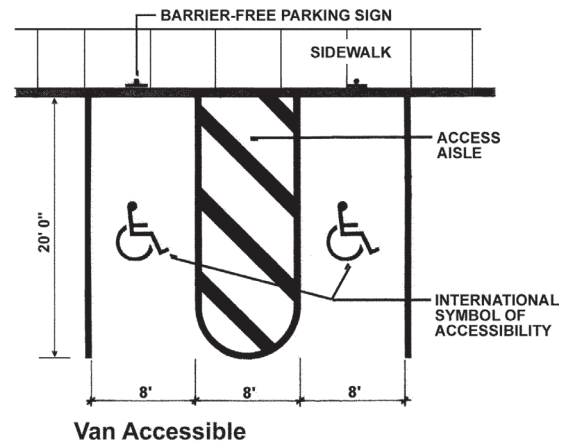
B Dimensions, Configurations, and Striping of Barrier-Free Parking Areas.
